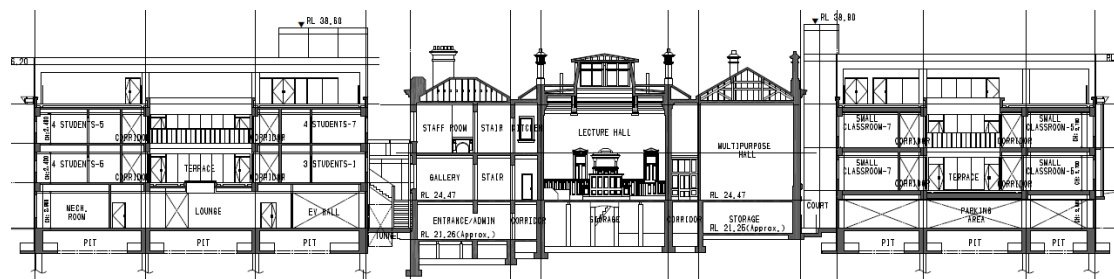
The longitudinal section through the Courthouse and new residential and education buildings. (Azusa Sekkei Architects)
